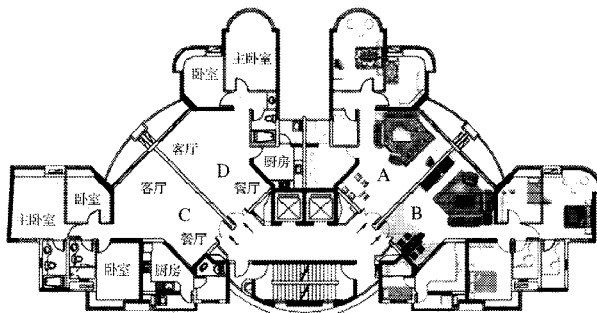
The plan of monomer house of Guangzhou Bihaiwan
